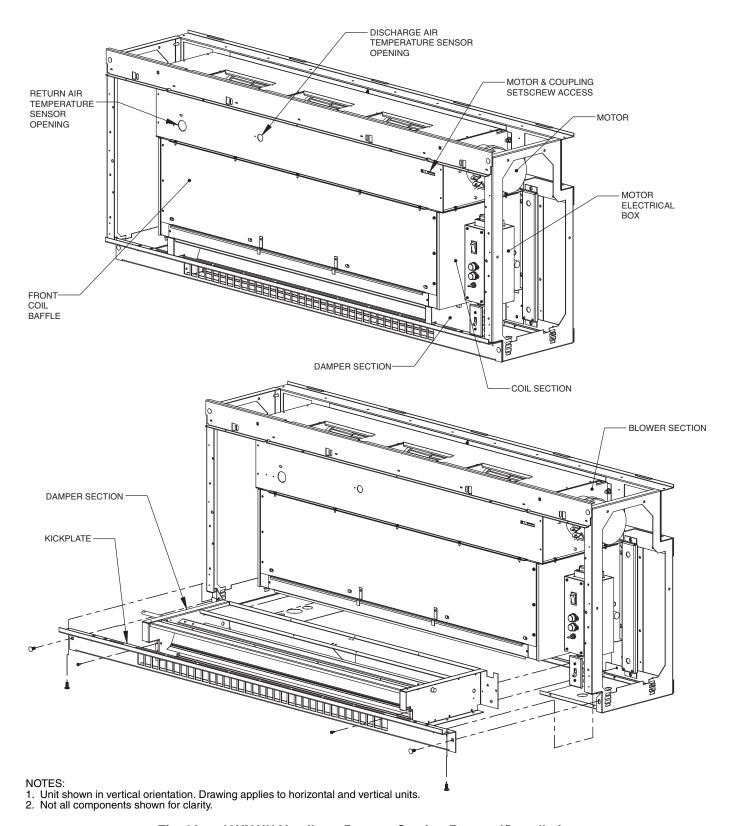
40UV,UH Ventilator Damper Section Removal/Installation
